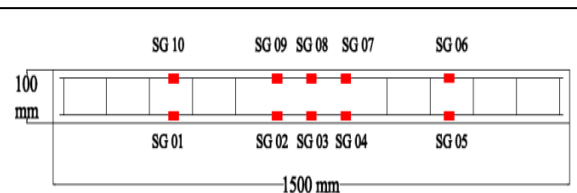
Plan view of the locations of strain gauge on rebars (tension side)
